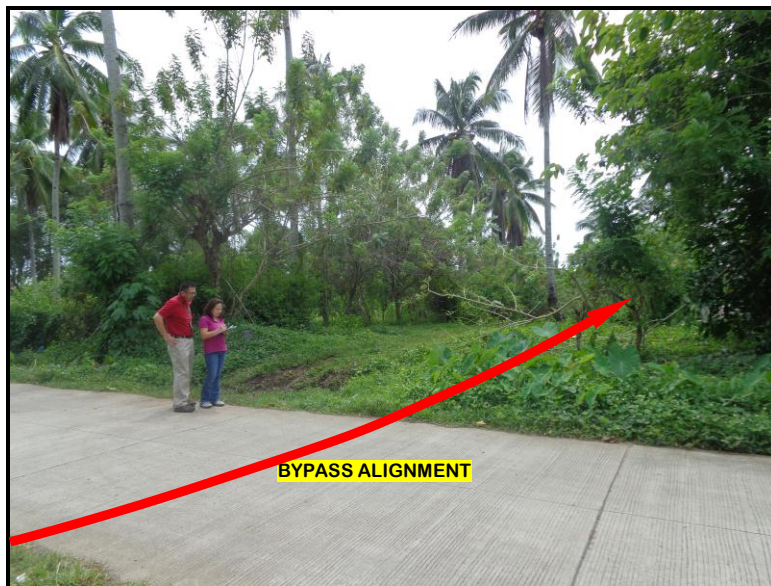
Taken at the intersection of the proposed bypass alignment and Catalunan Grande Road in Brgy. Tacunan.
